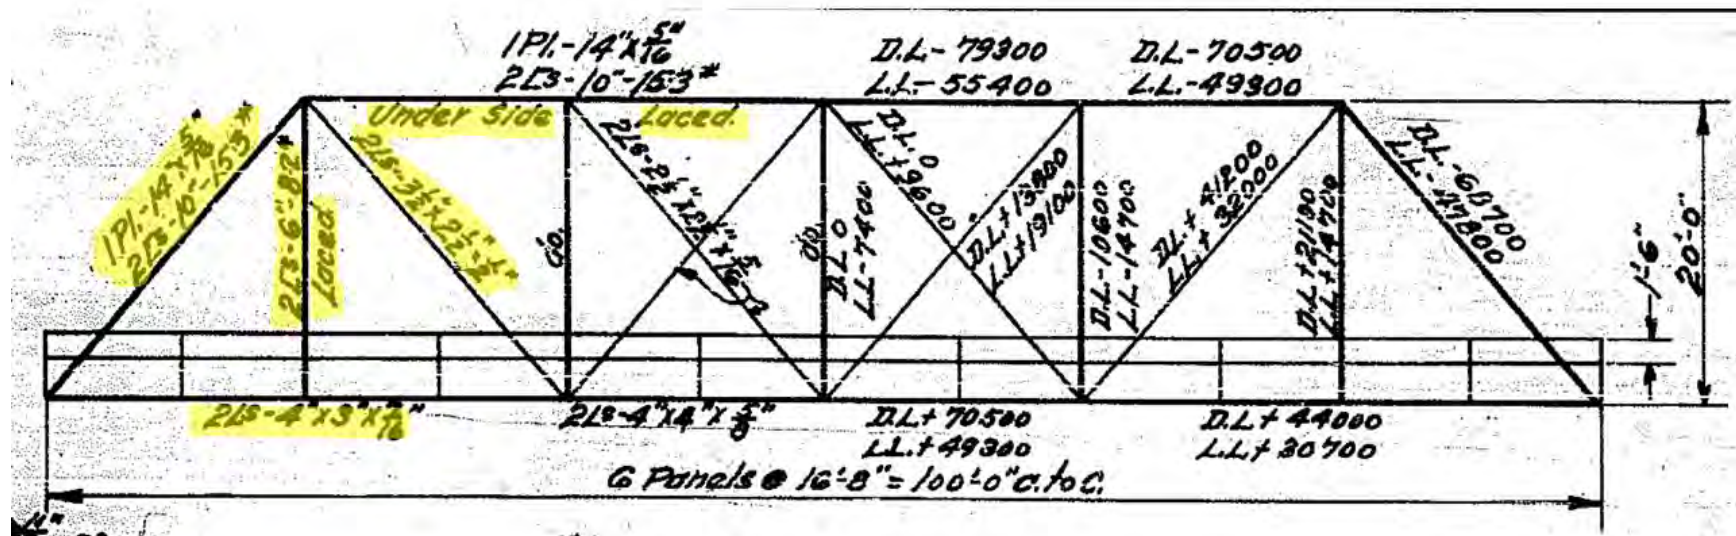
Cross section of the 1917 100-foot Pratt truss bridge in the A54 standard plan.¹²
